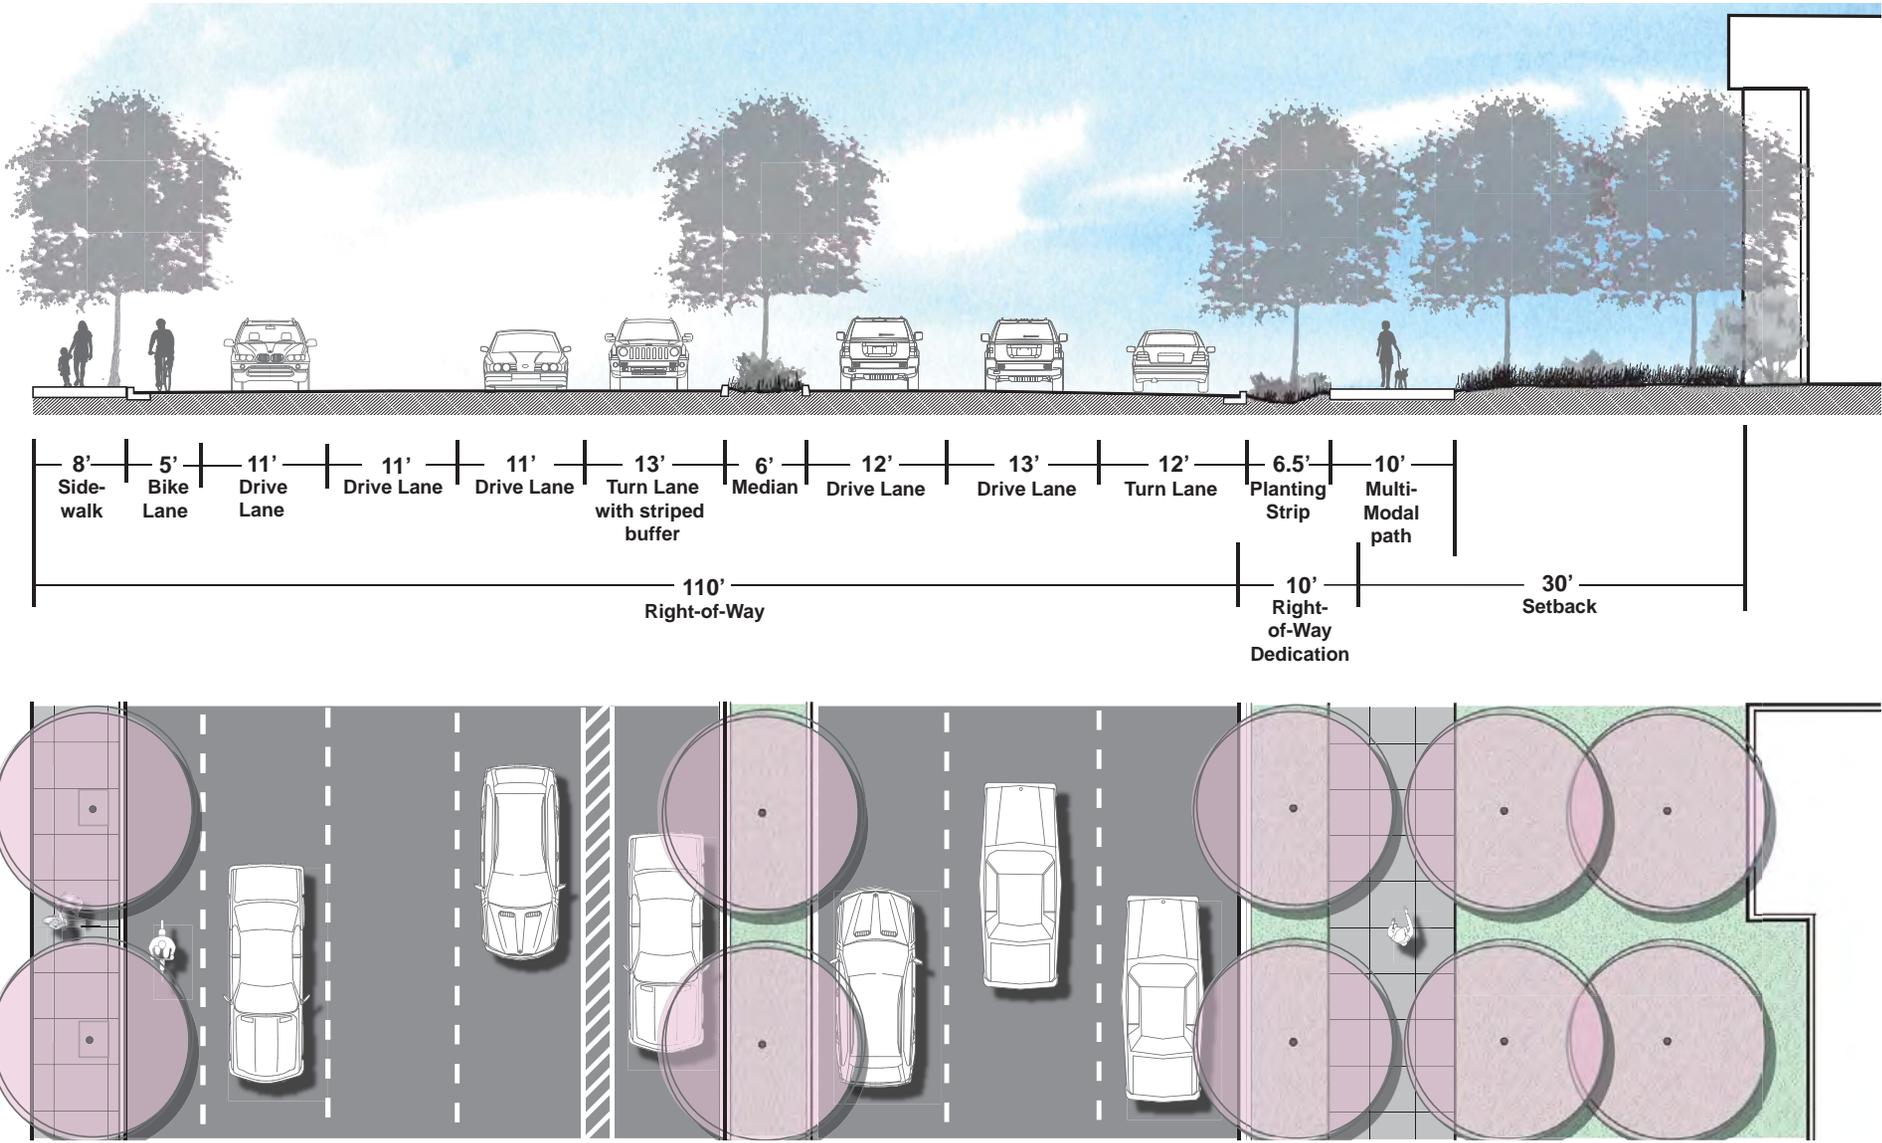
Section 3b: Lark Avenue looking west between 'South A' Street and Highway 17. Note: Sidewalks/multimodal paths which extend outside of right-of-way will require an easement.
